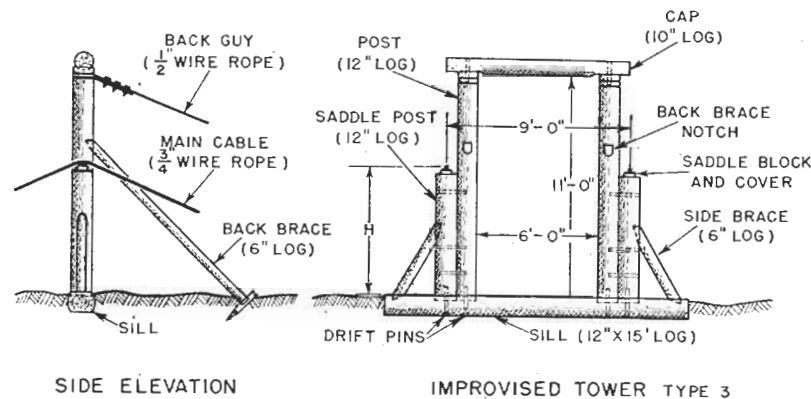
Improved tower type-3. Used on spans of 140 feet or less. The same tower design is used for the light-equipment bridge.
